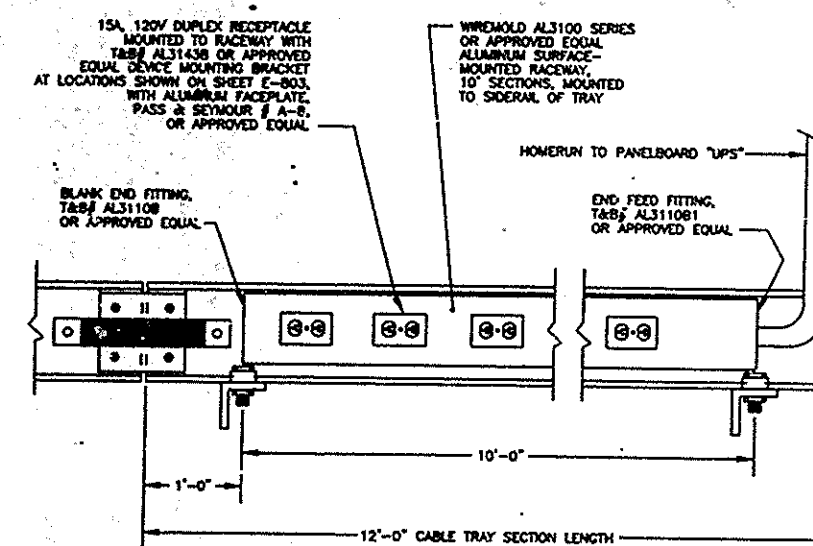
CABLE TRAY SUPPORT AND MOUNTING
